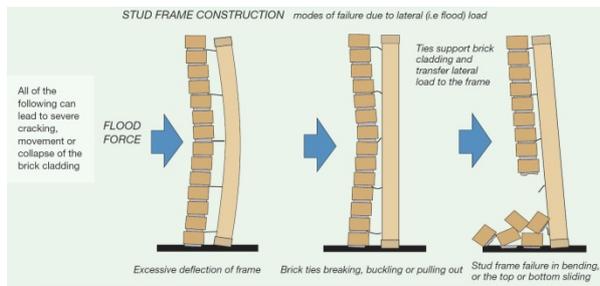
Typical brick veneer wall failure from flood forces (Hawkesbury-Nepean Floodplain Management Steering Committee, 2006)
